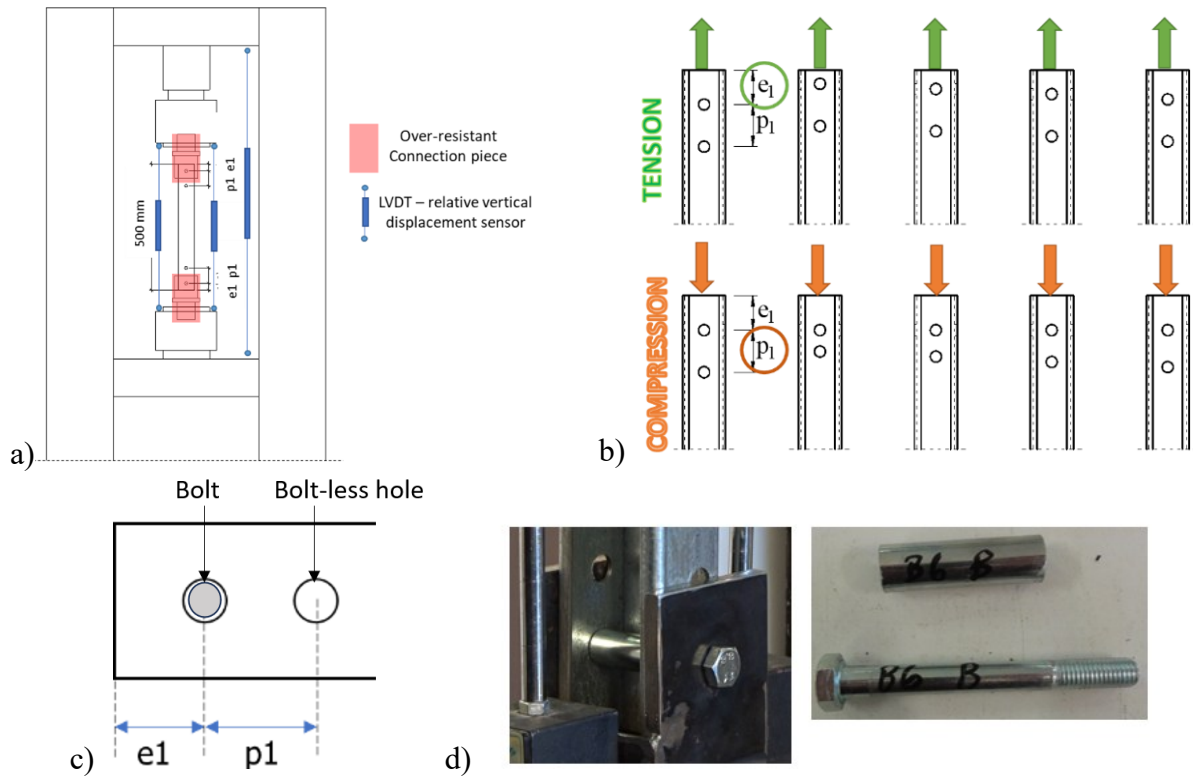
Test setup for the uniaxial test, a) global view, b) layout of the holes' position in the specimens and c) position of the bolt and the bolt-less hole.
